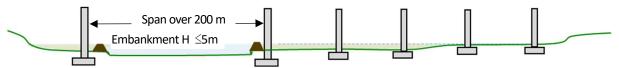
Image of Temporary Cofferdam Avoiding Pier Construction in River
